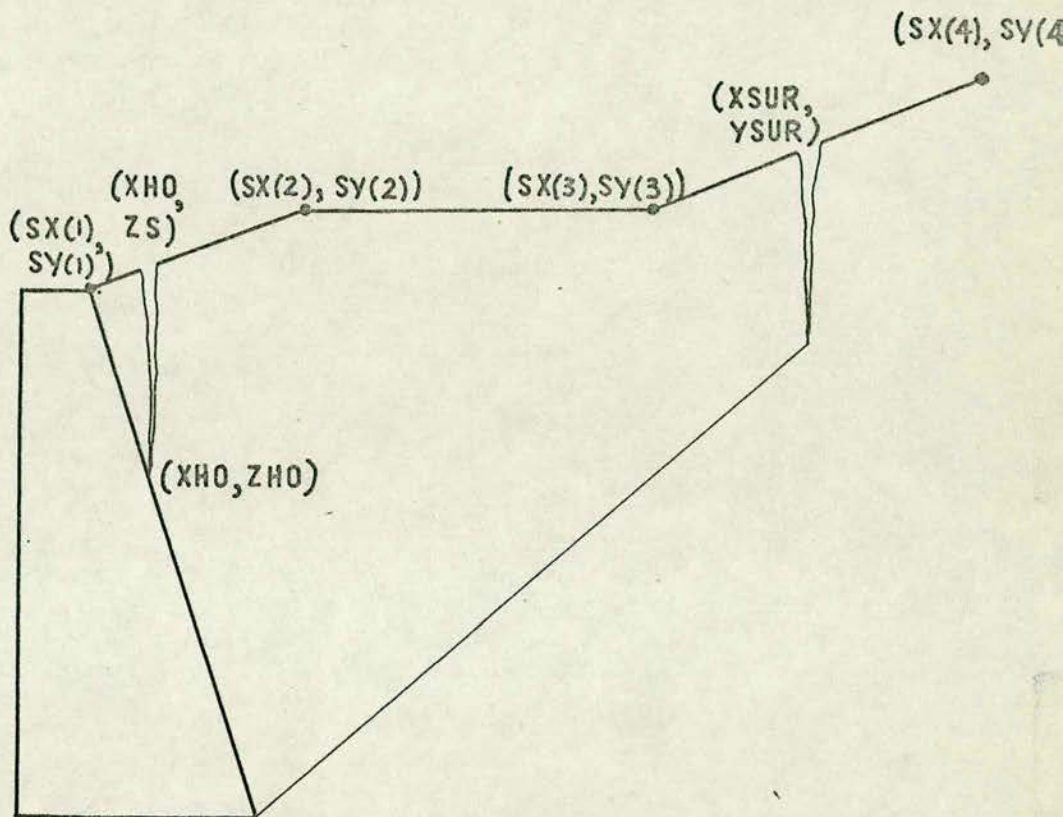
DEVELOPMENT OF TENSION CRACKS BEHIND WALL
